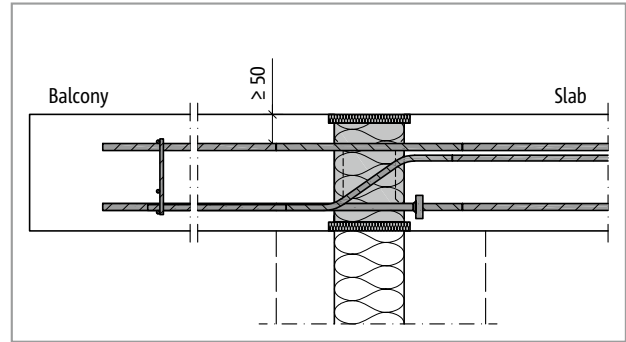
Schöck Isokorb® XT type C-CV50: Connection with non-load-bearing cavity wall masonry
